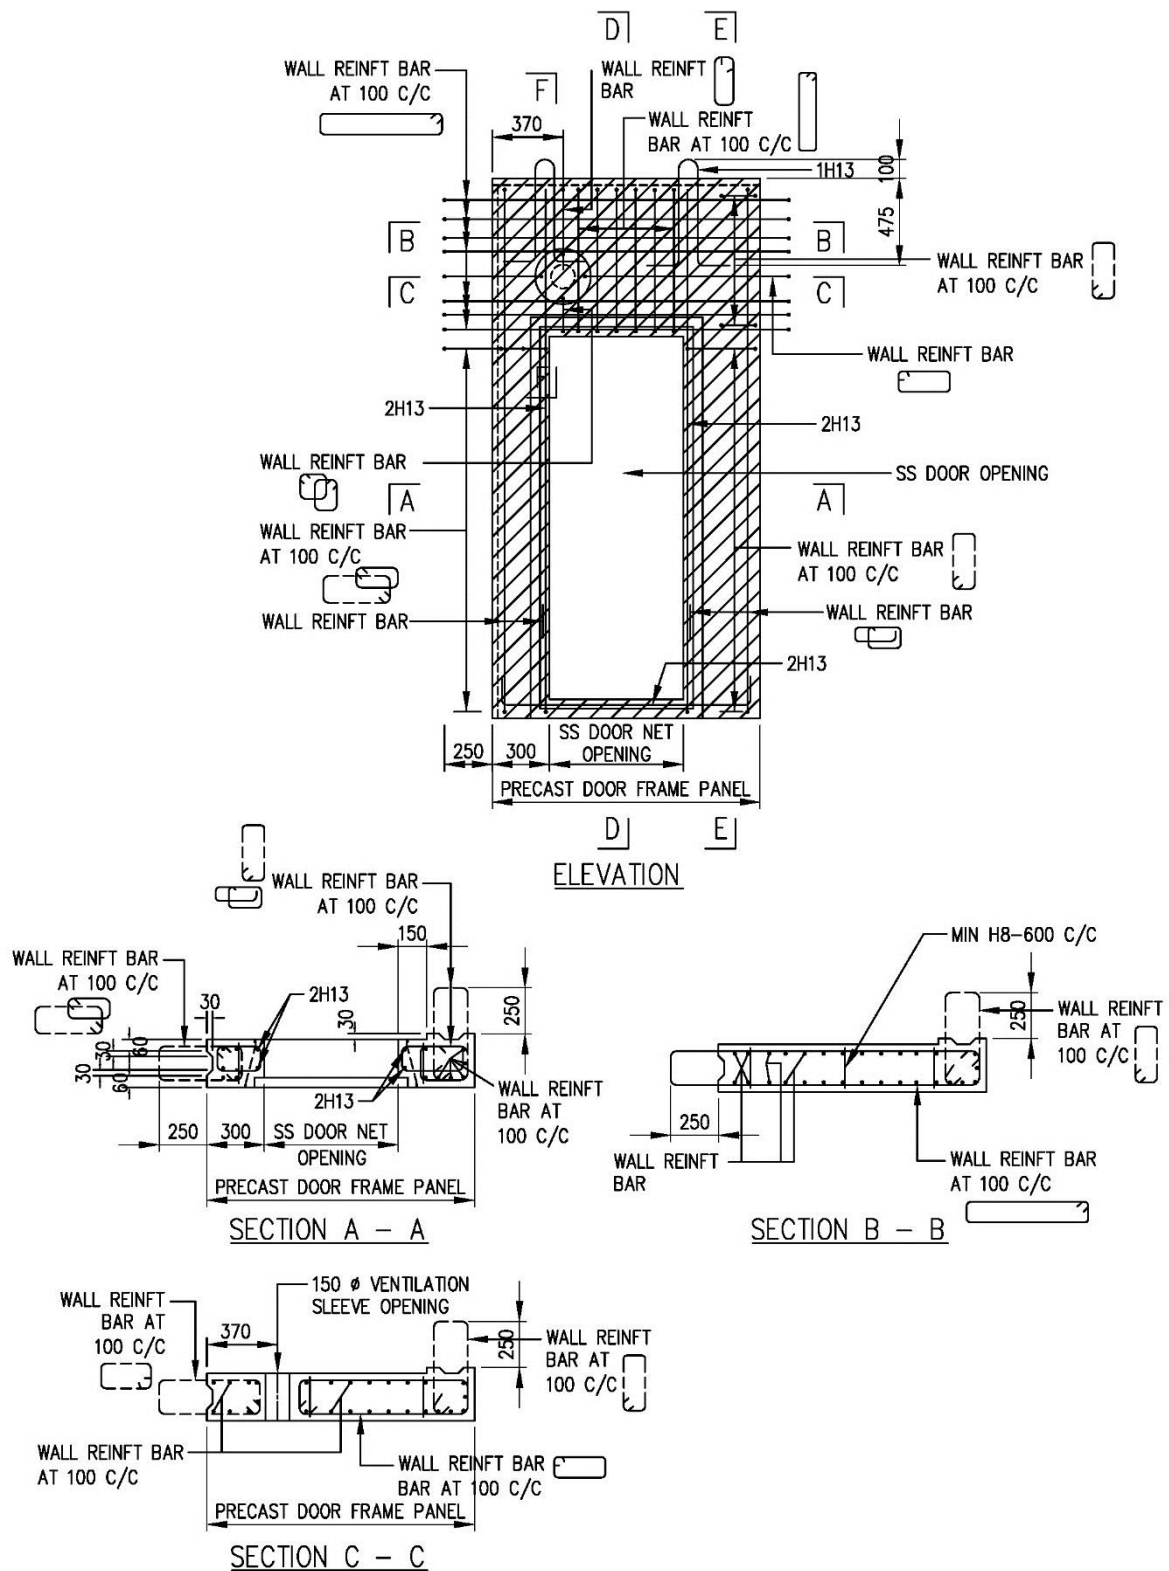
PLAN OF PRECAST HS, SS or SSS DOOR FRAME (TYPE 2)
